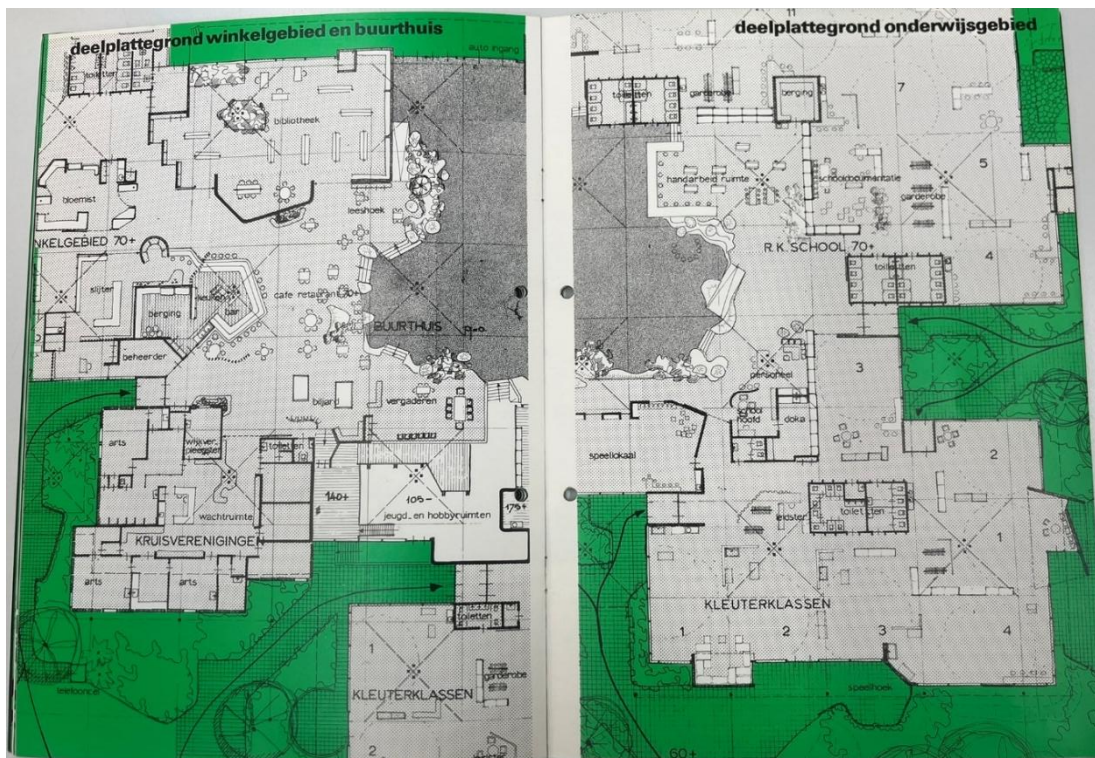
, Ground floor plan of 't Karregat (Design booklet 't Karregat, n.d.)
